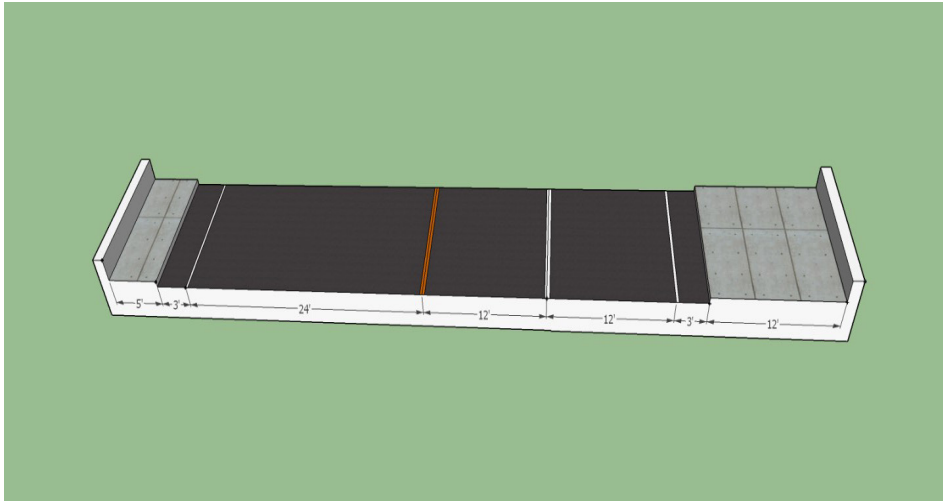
Current design of Cherokee Avenue bridge over I-20 in Grant Park, looking north
